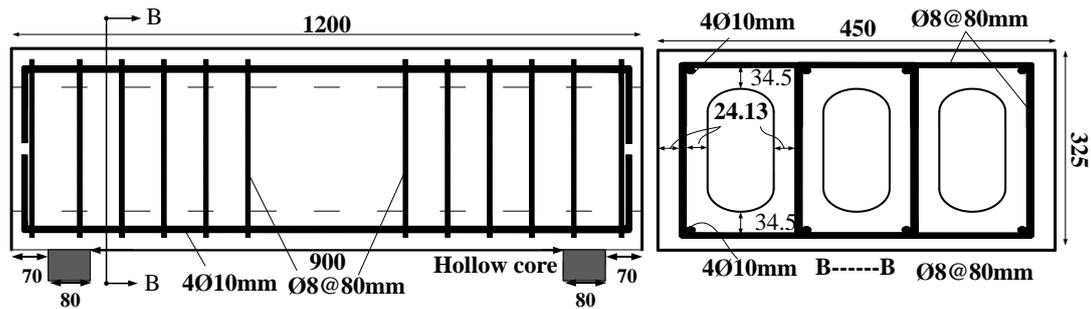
The Details of Section and Side View of HCS Specimen (HCS-250-B) (all dimensions in mm)
